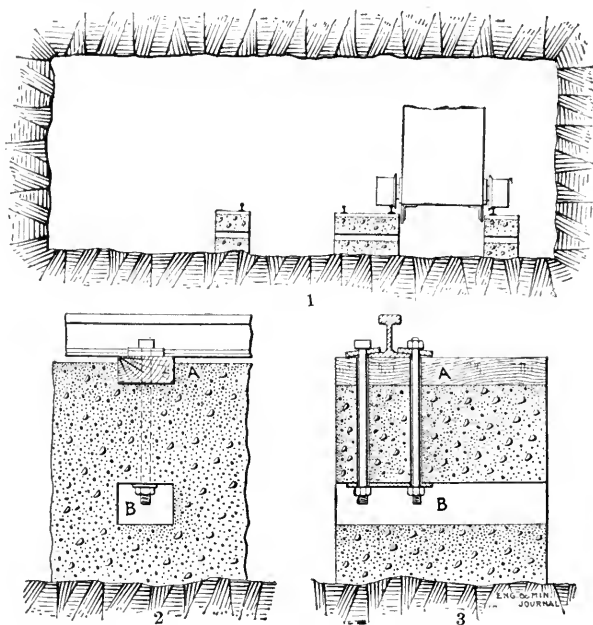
WOODEN TIES IN CONCRETE STRINGERS.
